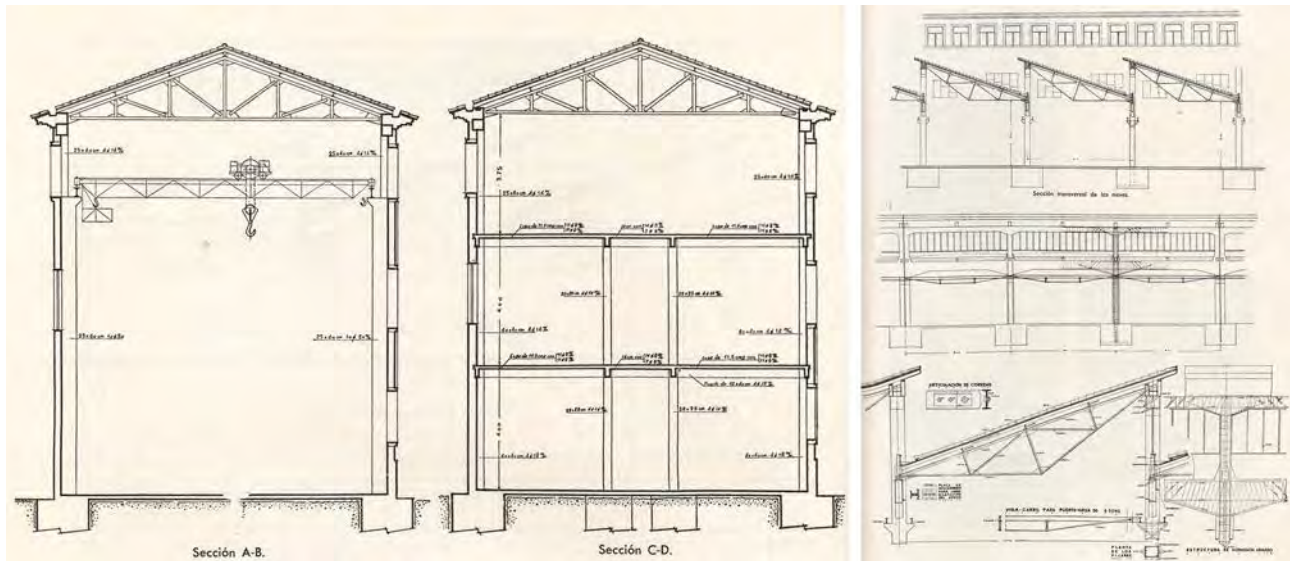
Plan view and section. Main building Giesa (source: *Revista Nacional de Arquitectura*, n° 30, 1944).
